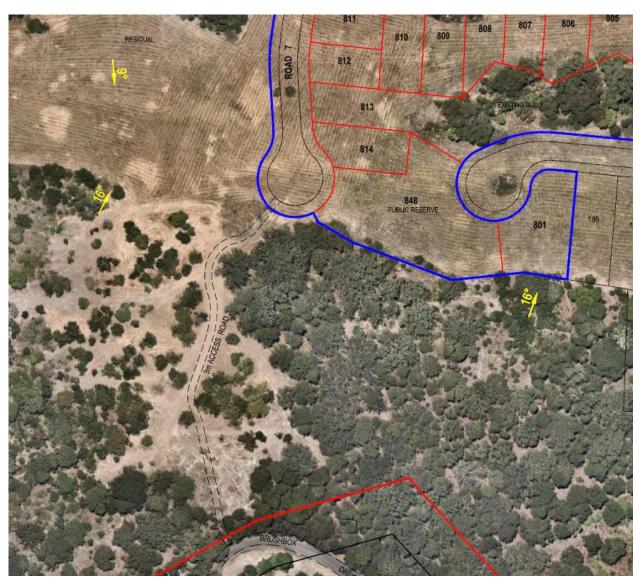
Location of Bikeway/ Footpath from Brushbox Drive to Road 7.
